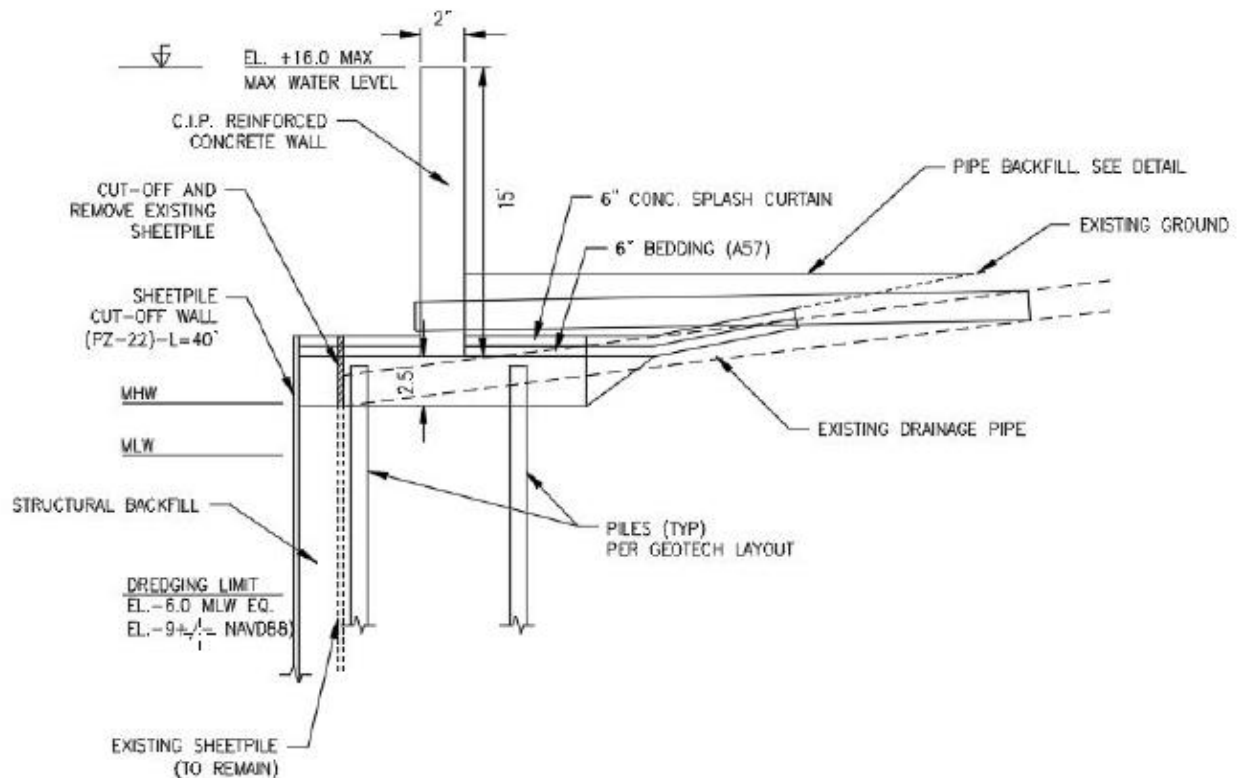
Typical Section – Concrete Cantilever Wall – Type C
